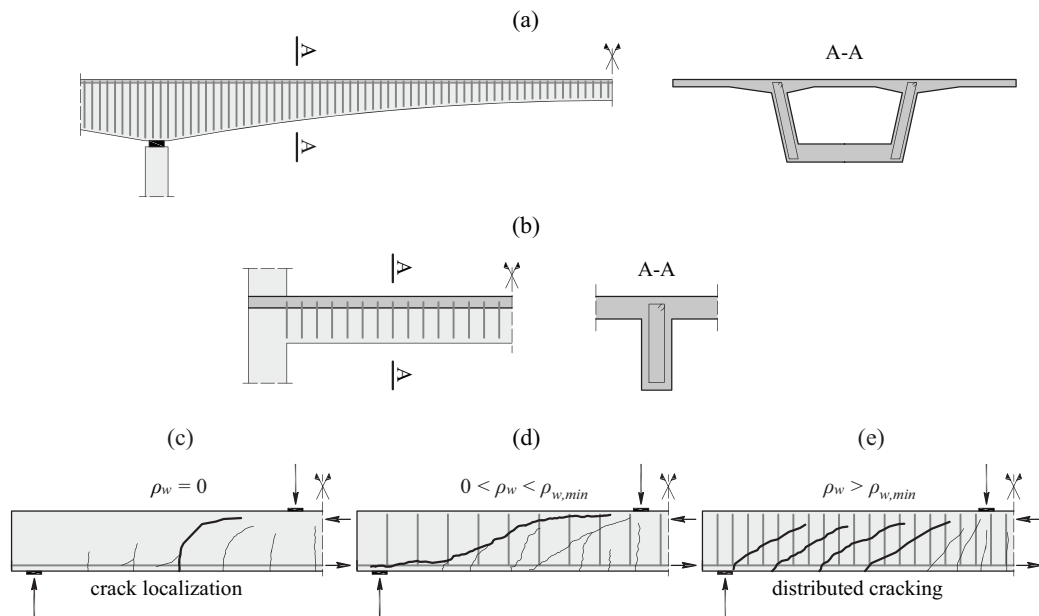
Applications of shear reinforcement in (a) bridges; and (b) buildings. Influence of the amount of the shear reinforcement on the cracking patterns: (c) beam without shear reinforcement; (d) beam with low amount of shear reinforcement; and (e) with larger amount of shear reinforcement.
